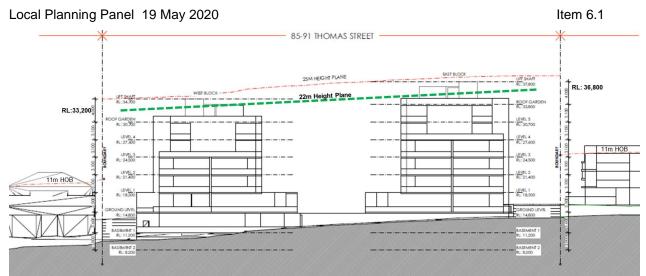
Section facing north from Parramatta River with adjacent properties (Source: PTI Architecture)
